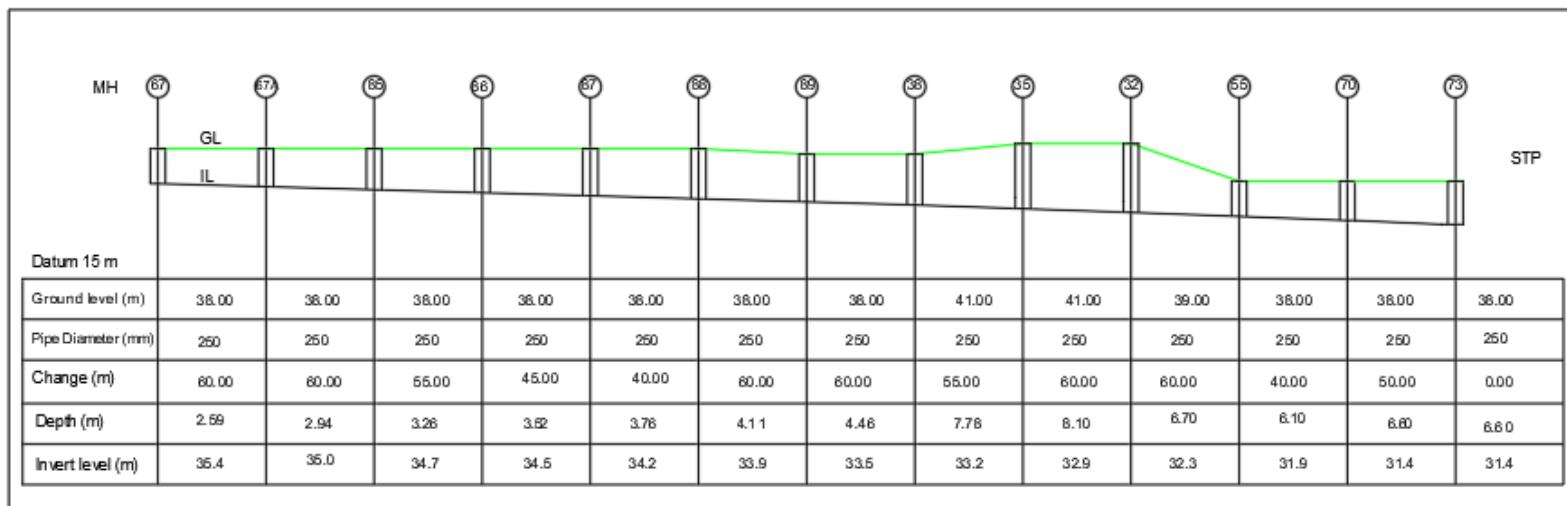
Longitudinal Section for Manhole with Diameter of 225mm
